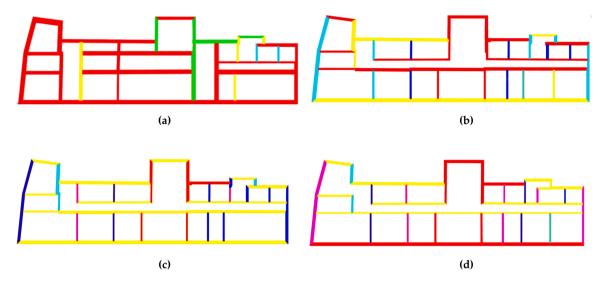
FRCM system (a) ground floor plan (b) first floor plan (c) second floor plan (d) attic floor plan.
